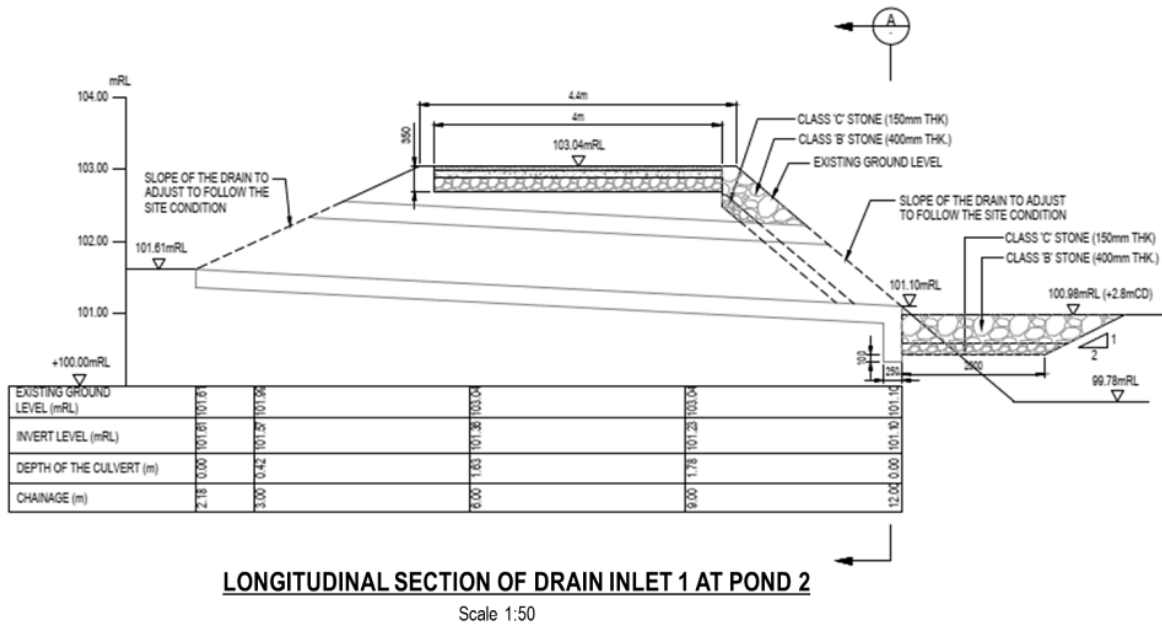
Cross-sectional view of proposed drain inlet 1 at Pond 2.
